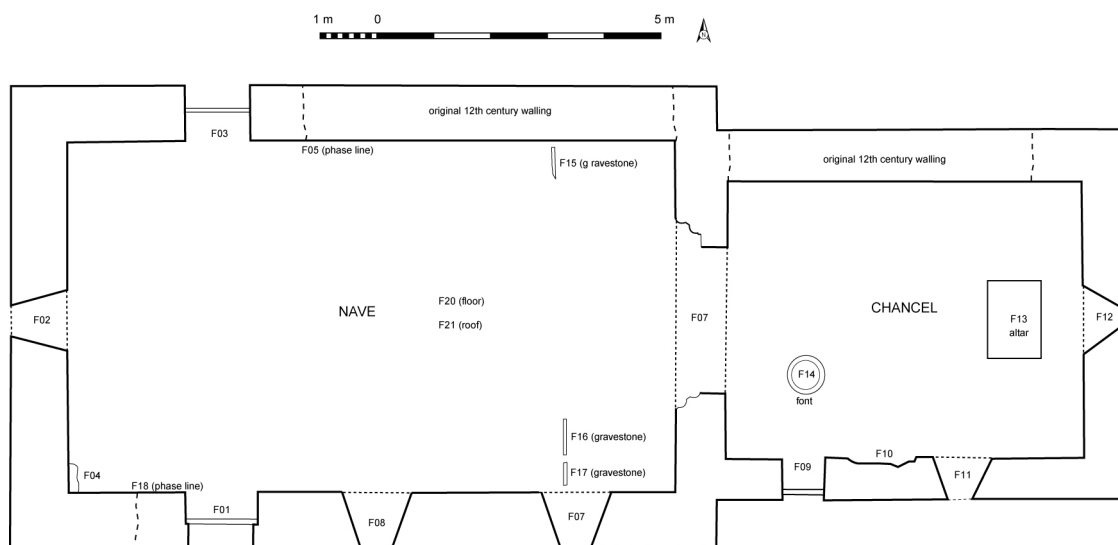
Floor plan of Cruggleton Church (1 to 75).
